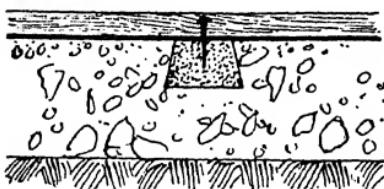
Concrete Floor with Boards nailed to continuous lines of Wright's Fixing-Blocks.
